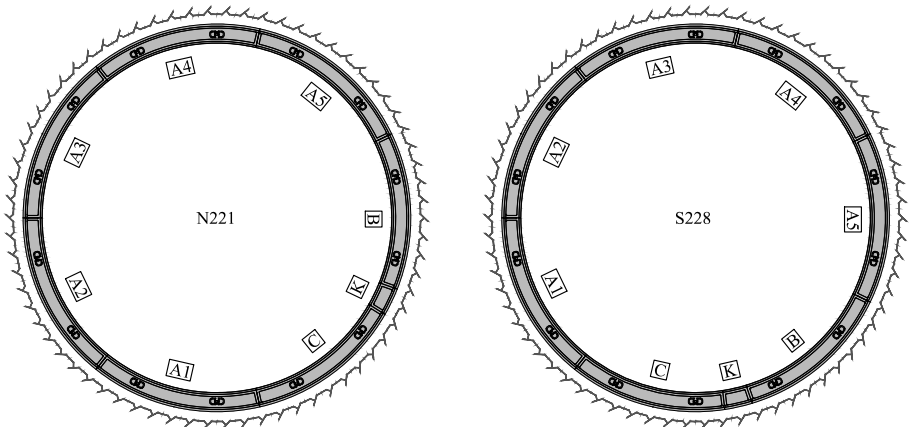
Segment orientation in tunnel sections N221 and S228.
